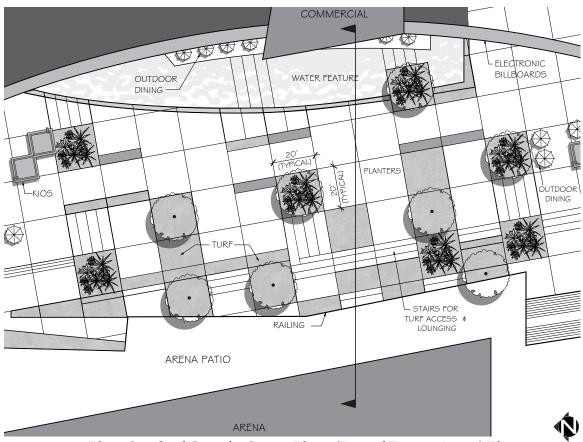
Shared Drive Between SA 17 & 18 (South of Toyota Arena) Private Streetscape Section and Plan
